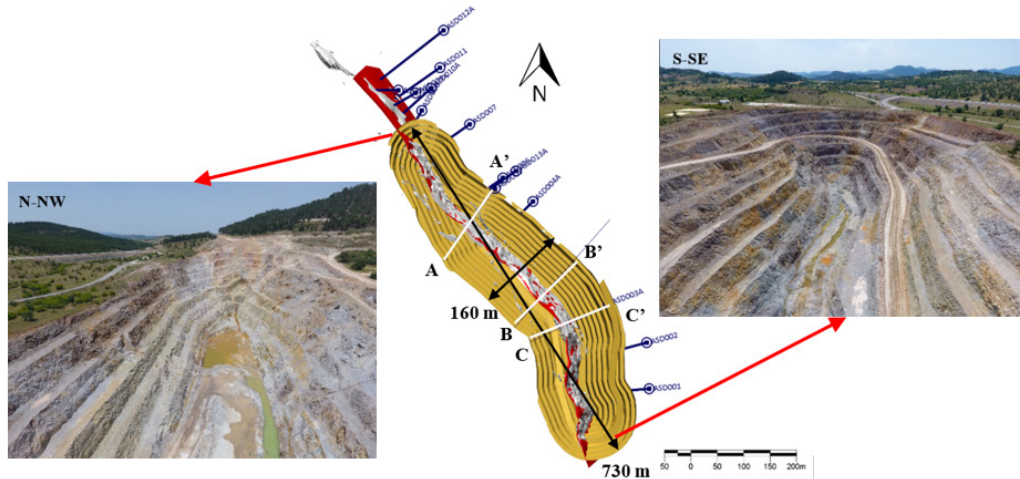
Overview of the open pit and the uniformly striking sub-sections of the vein.
